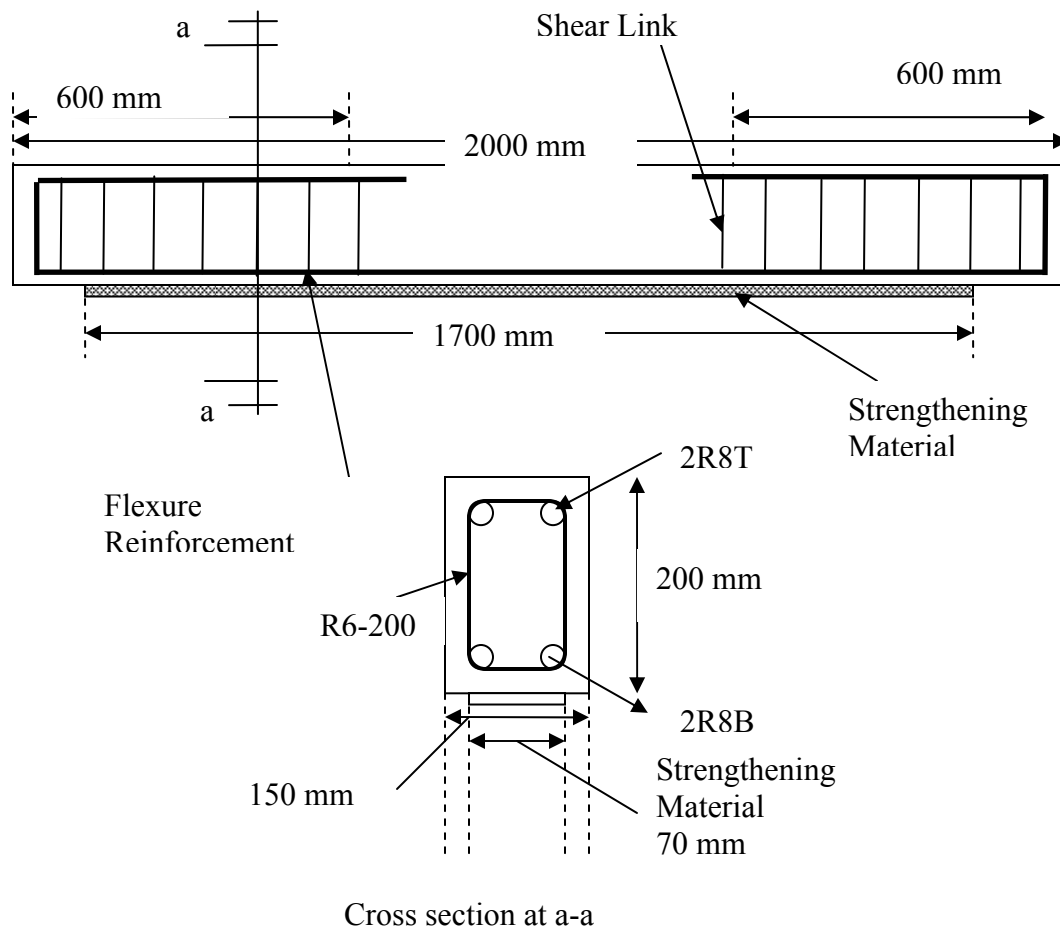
Longitudinal and cross section of the reinforced beam.
